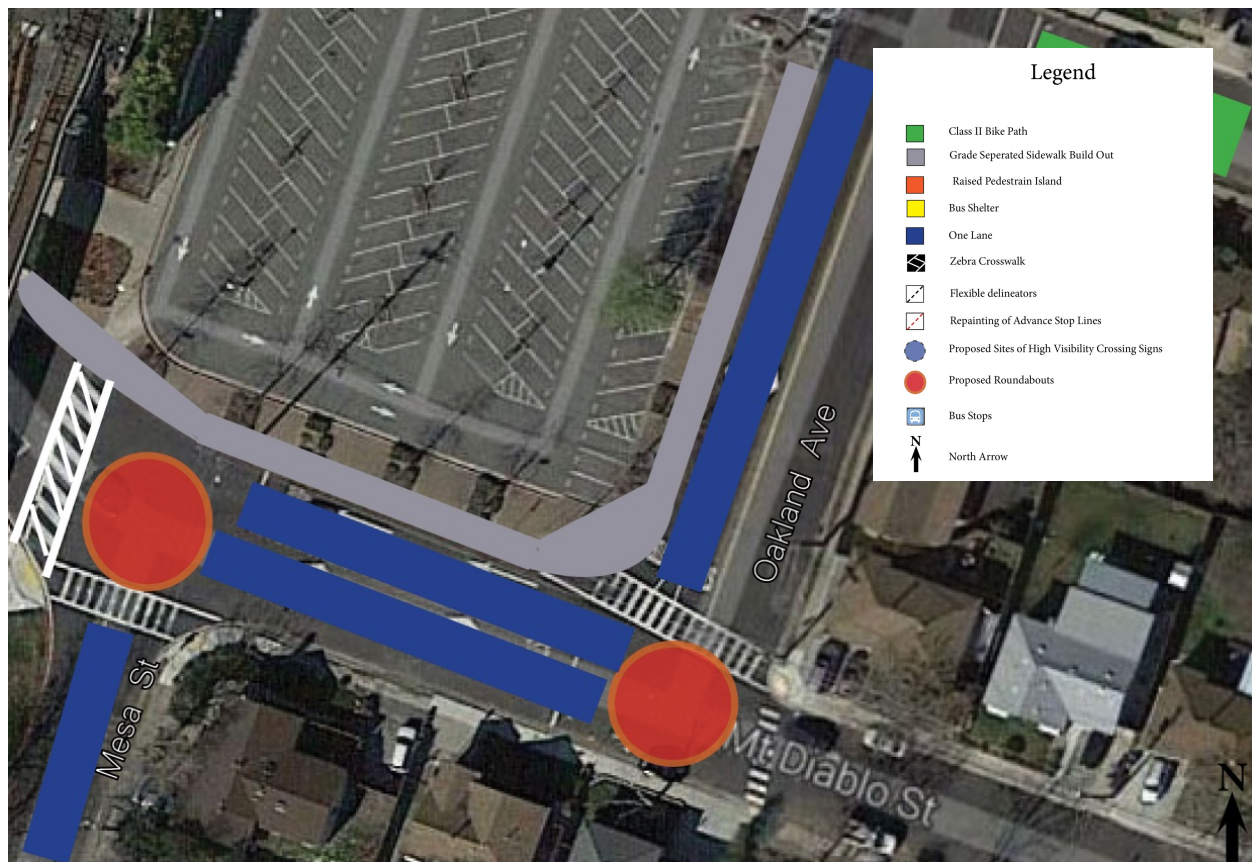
Mt. Diablo Street and Oakland Ave Intersection
